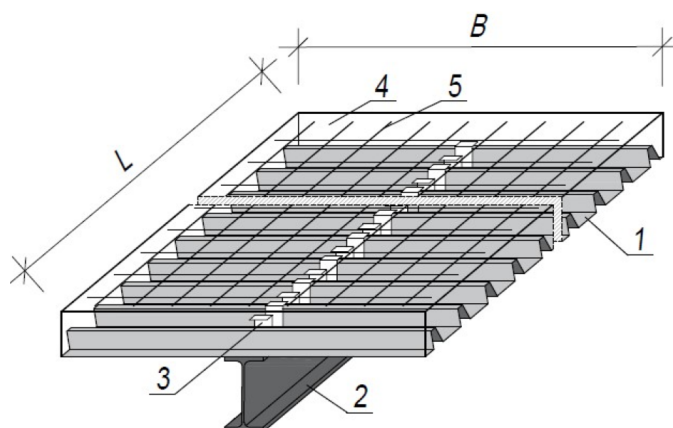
Steel-concrete composite girder made without the use of welding: 1 – profiled steel sheet, 2 – steel I-beam, 3 – U-shaped connector, 4 – concrete slab, 5 – reinforcing bars
